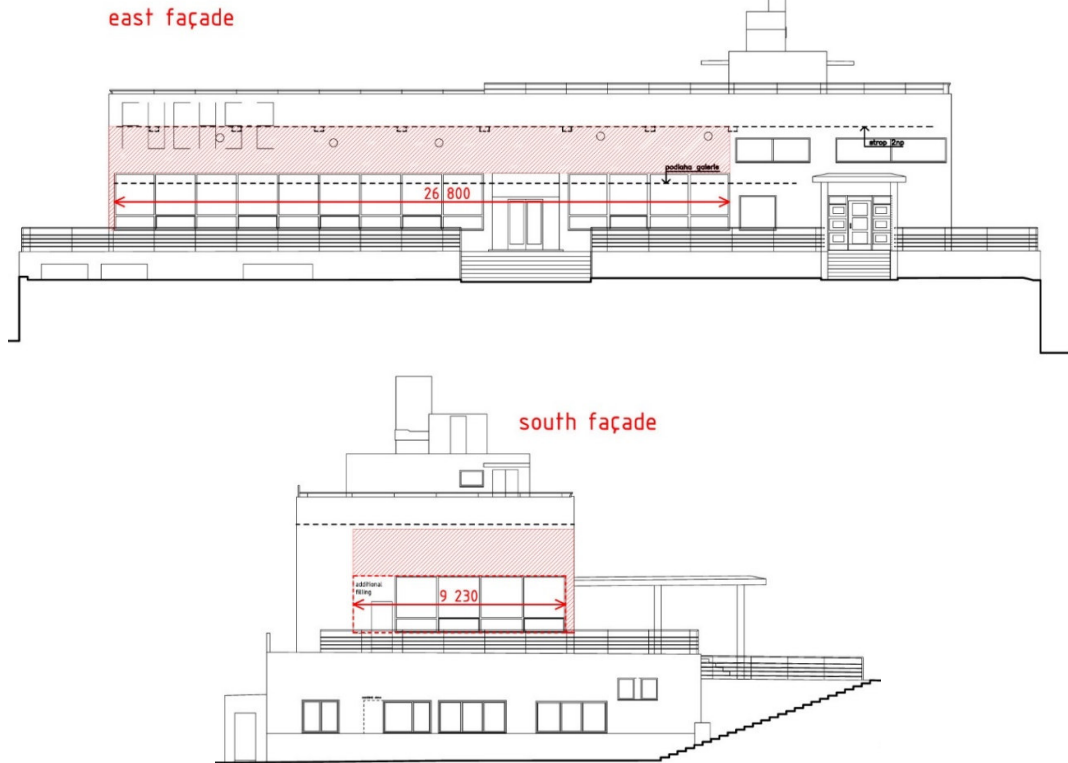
East and south façade (current state) showing the original span of the lintel walls (marked in red).
